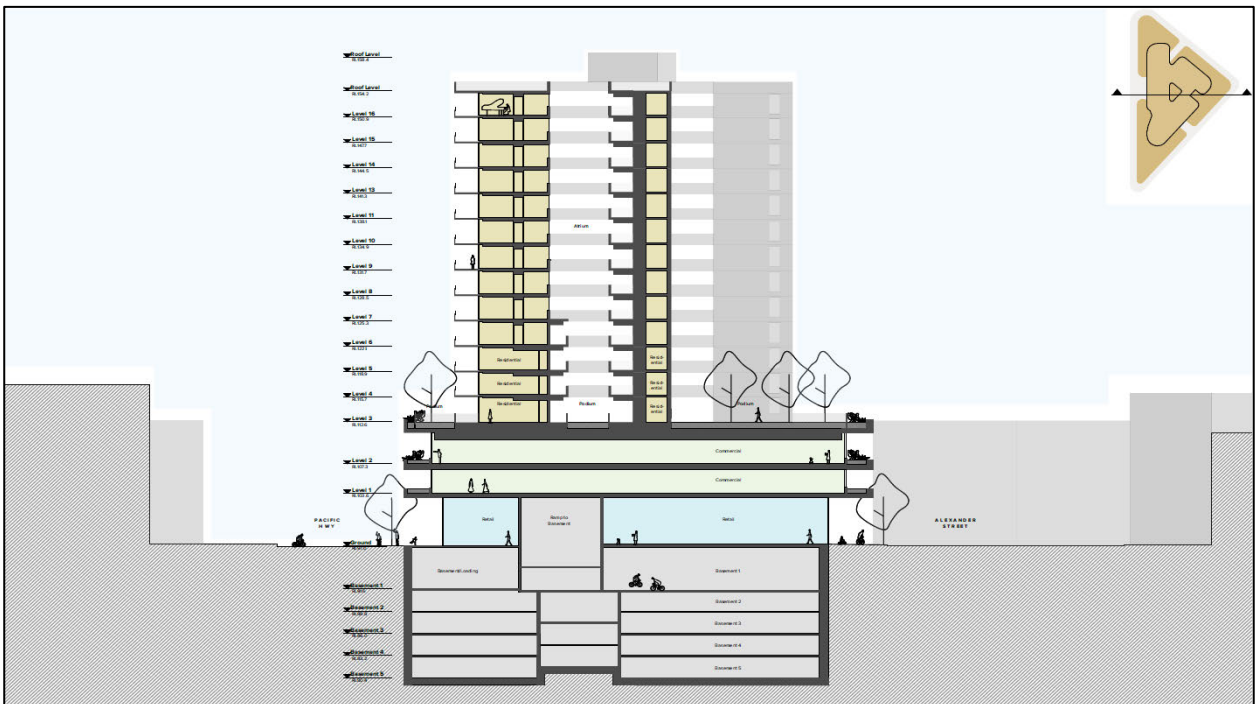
Proposed development section (source: *Urban Design Report, Turner*)
